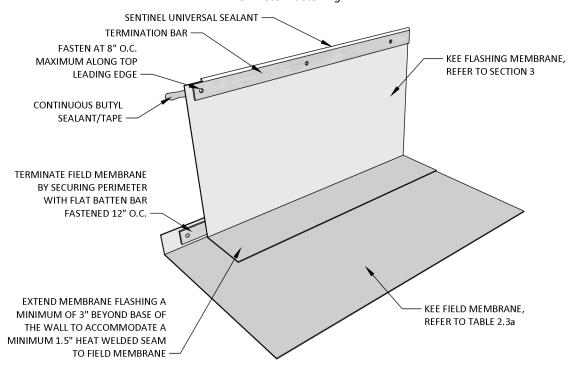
Induction Welded KEE Field Membrane with Adhered Flashing Membrane at Wall/Curb and Vertical
